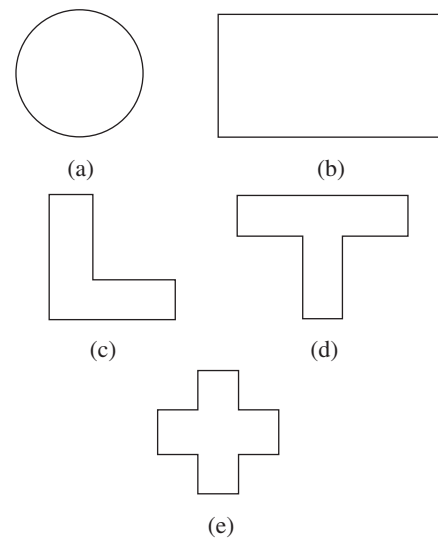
Different shapes of columns (a) Circular (b) Rectangular (c) L-section (d) T-section (e) Cross section
